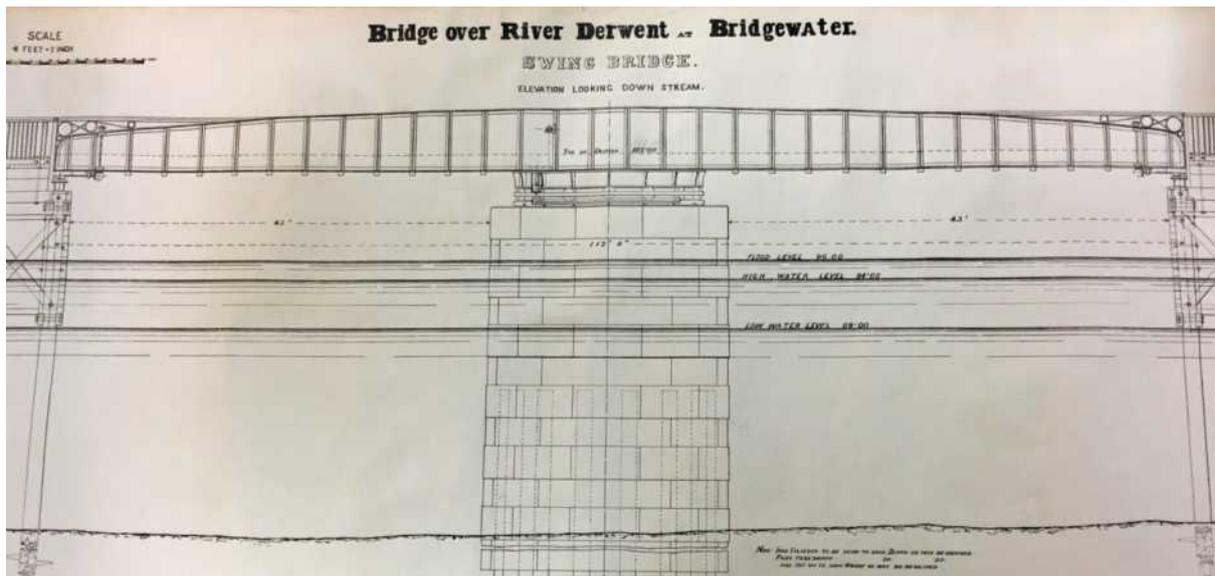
1890 plan showing plate girder swing span atop the iron and concrete caisson (TAHO, P1330/1/388, Plan 8844119 (12903) TGR - Bridge over River Derwent at Bridgewater - swing bridge elevation looking down stream (sheet 7) [lithograph])
